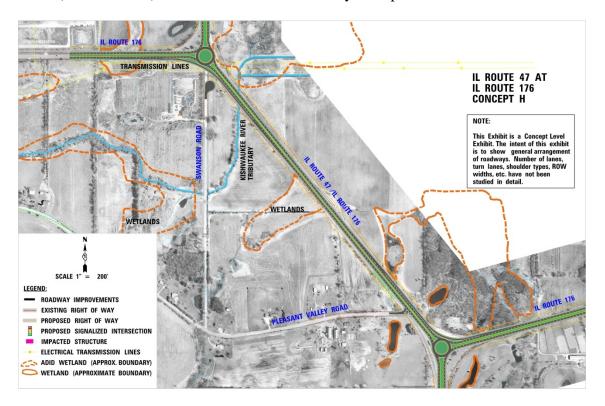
IL 47 at IL 176 Intersection Alternative H
